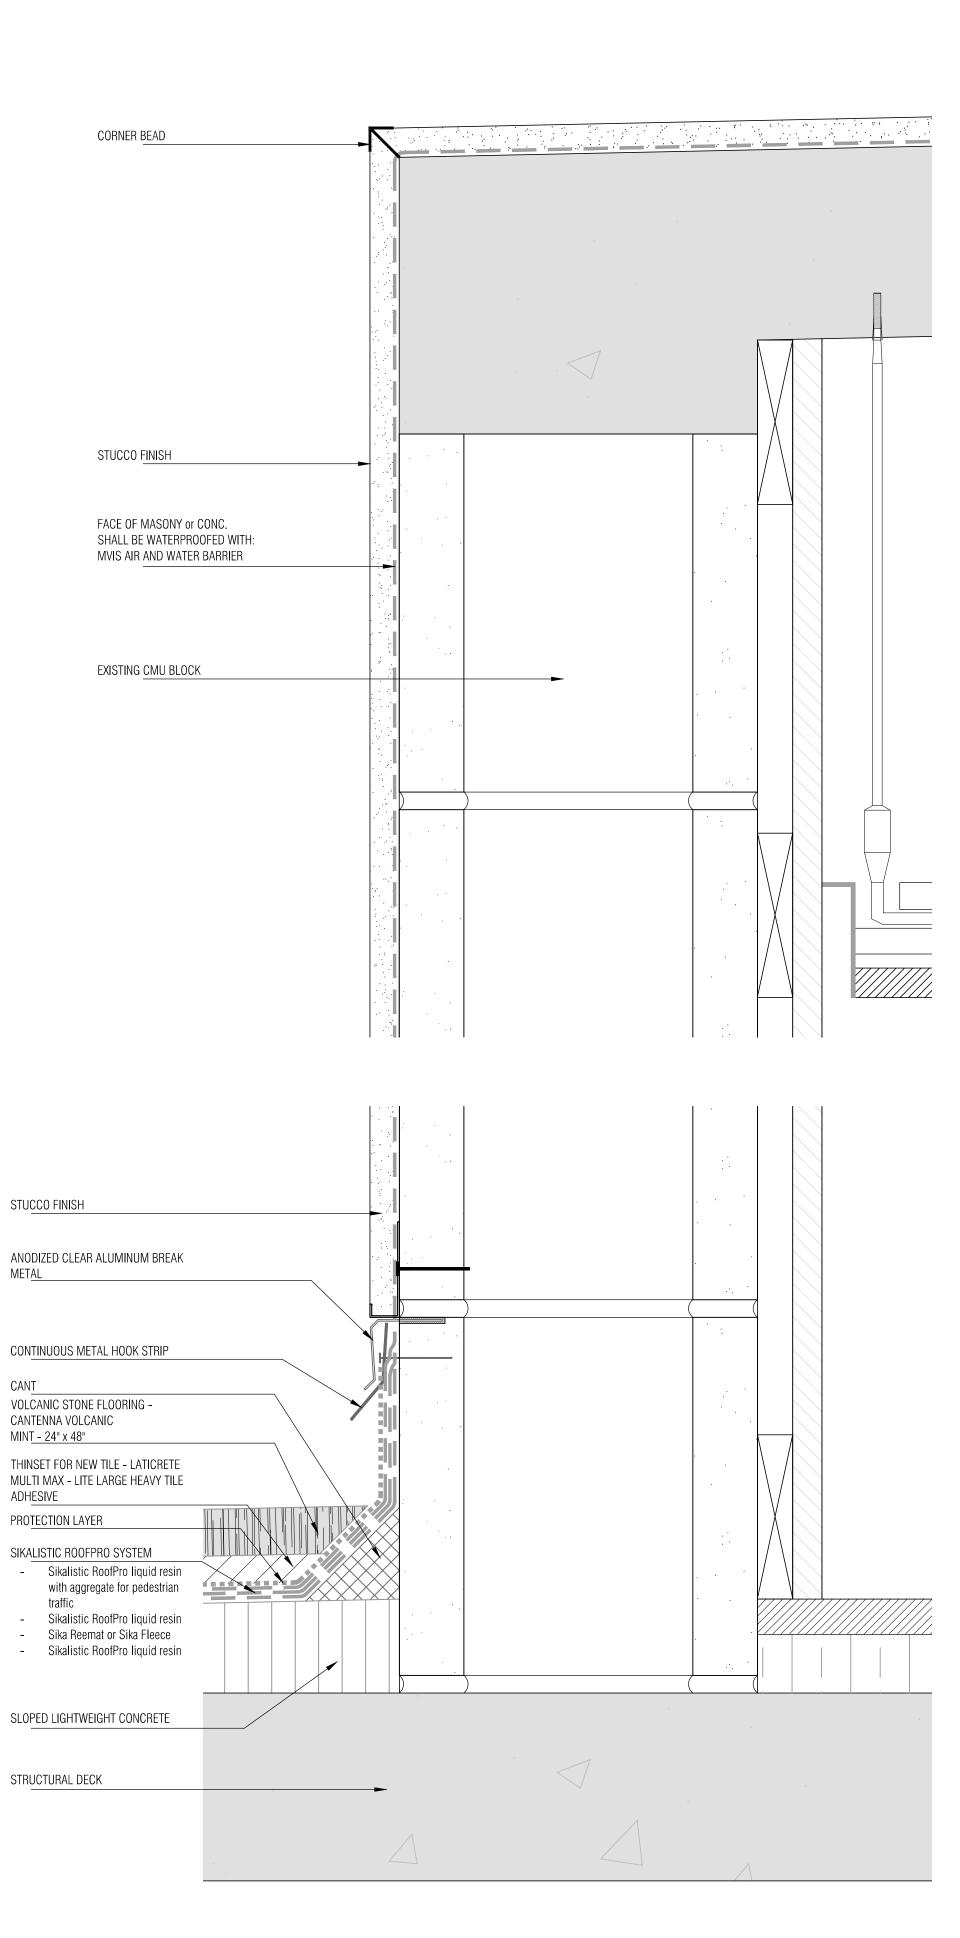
FRENCH DOOR HEADER & SILL DETAIL
